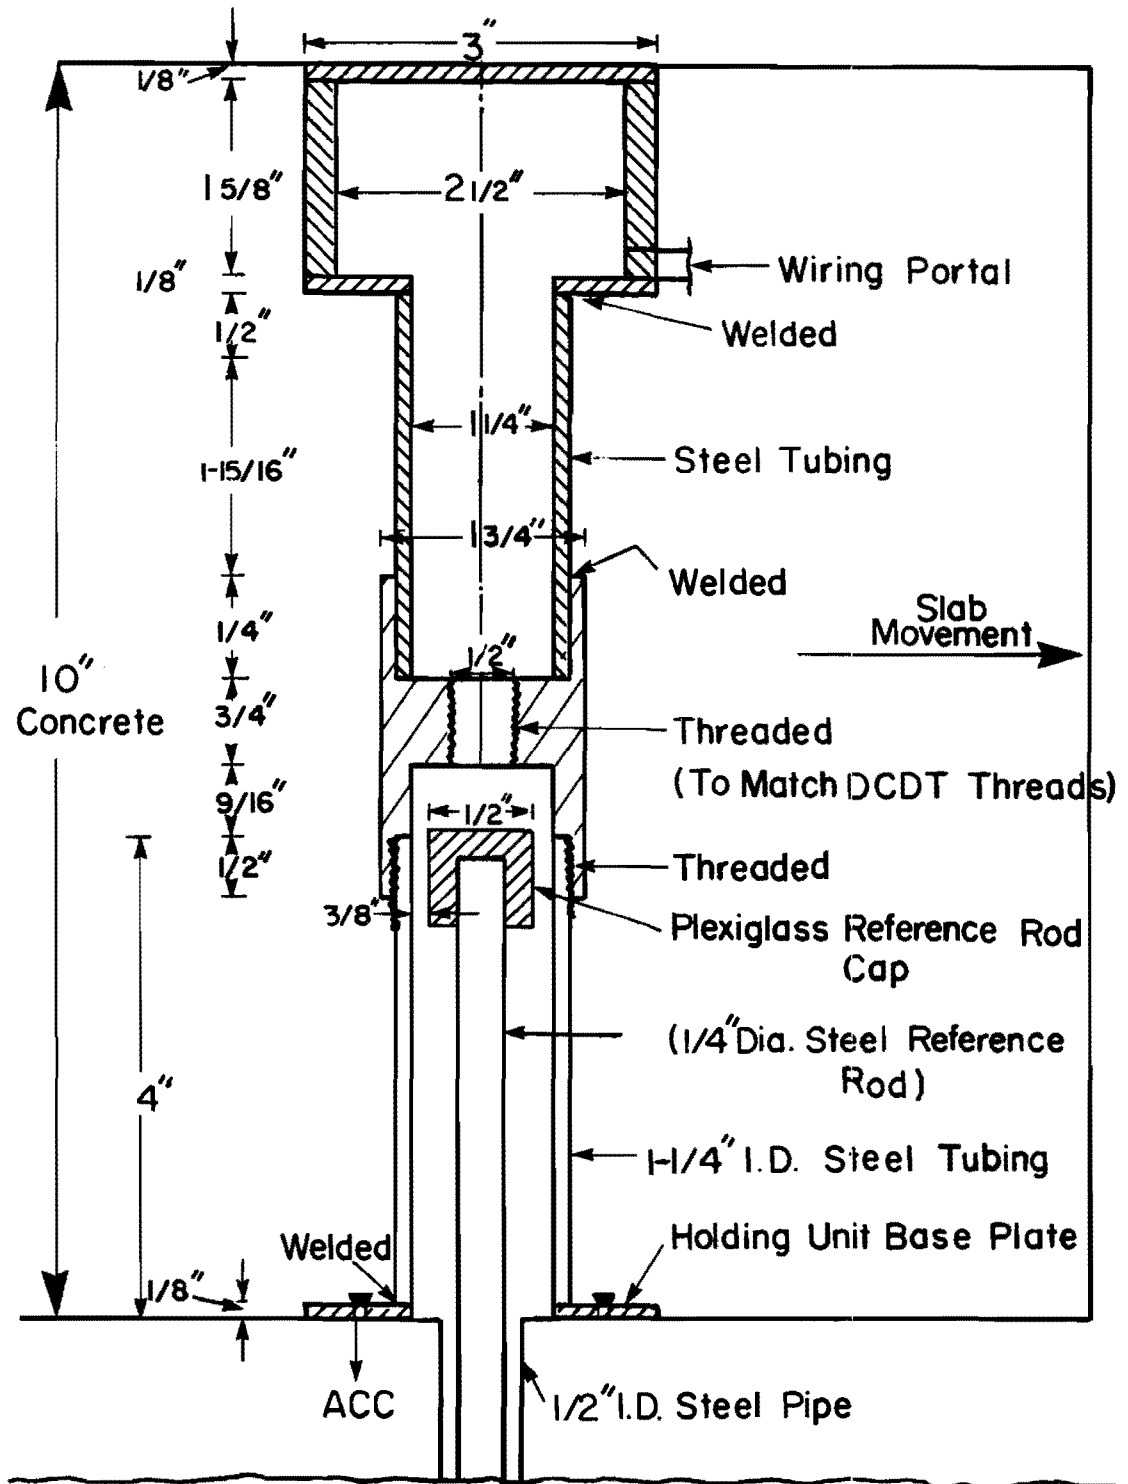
Typical cross section of DCDT holding unit (long slab).
